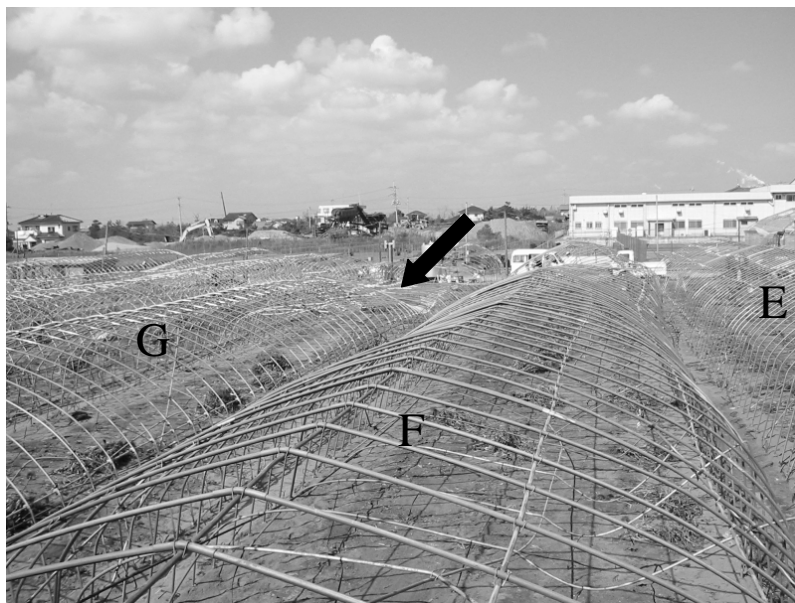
Mode of collapse for pipe house beside a factory.
